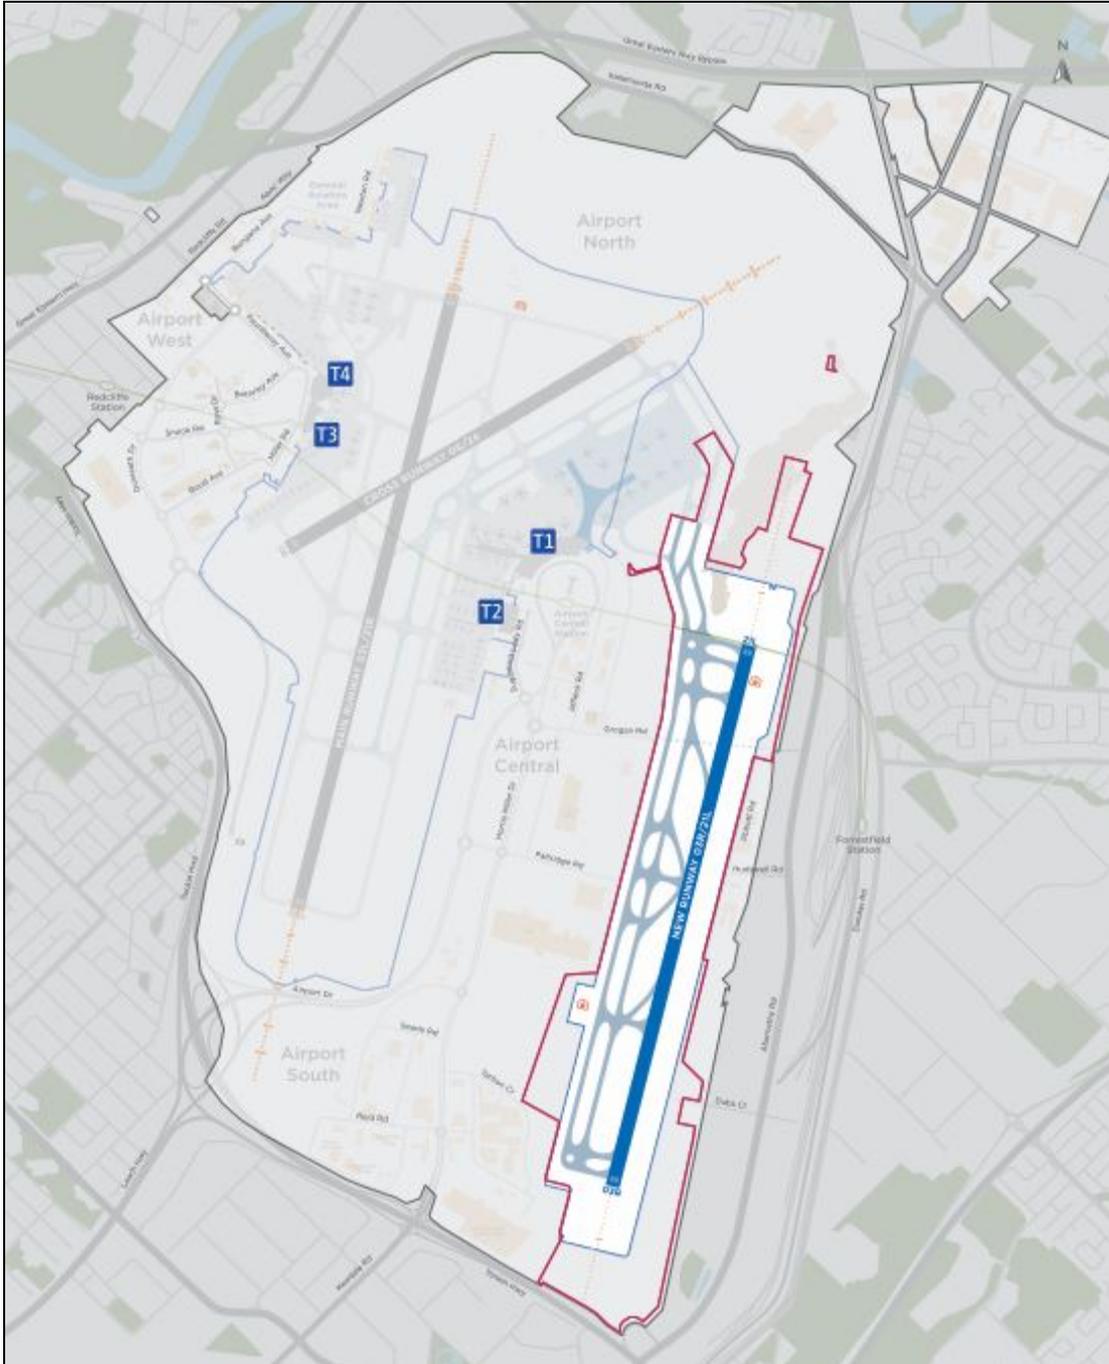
Location Plan depicting proposed New Runway (source: Perth Airport Preliminary Draft Major Development Plan)
